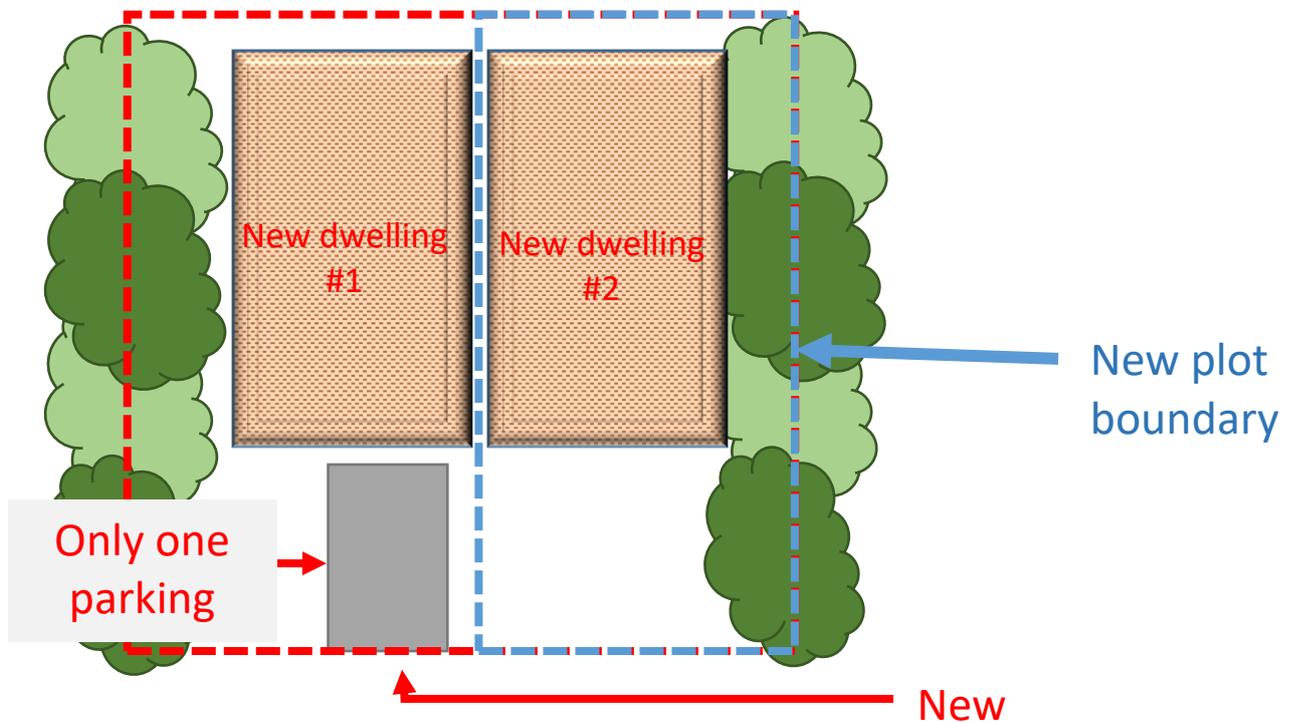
Proposed redevelopment of the site to provide two dwellings. The proposed development may retain, but not increase existing off-street parking provision on site.
